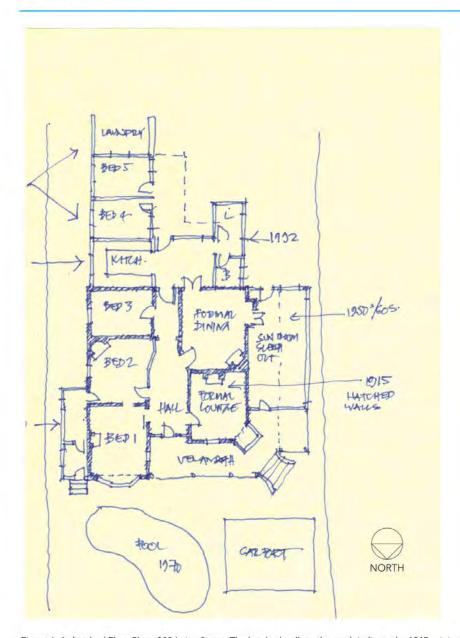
A sketched Floor Plan of 22 Irvine Street. The hatched walls to the north indicate the 1915 original walls of A.W. Nelson's design. Griffiths Architects, September 2021.
